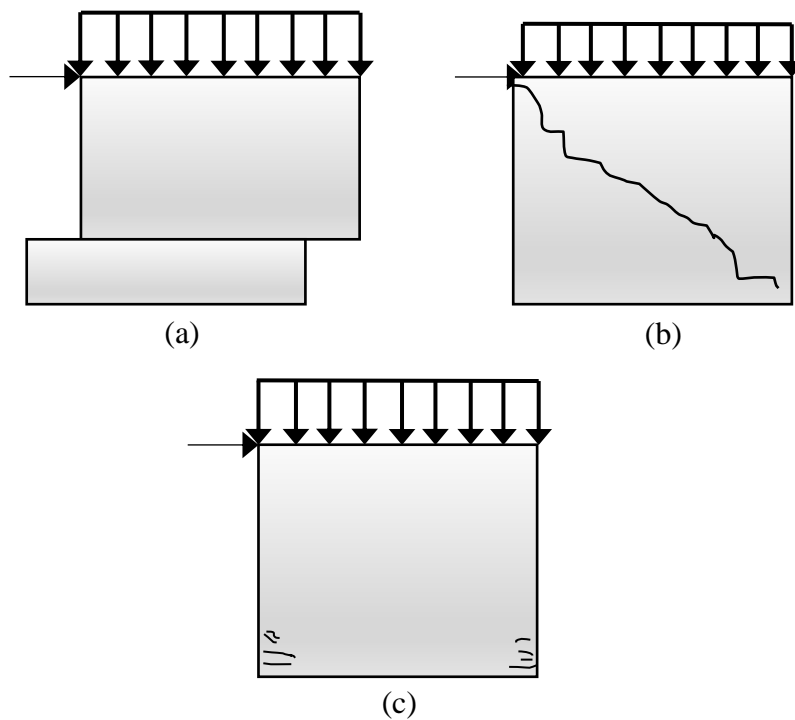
Failure Modes for Walls: (a) Sliding; (b) Diagonal-tension; (c) Rocking
